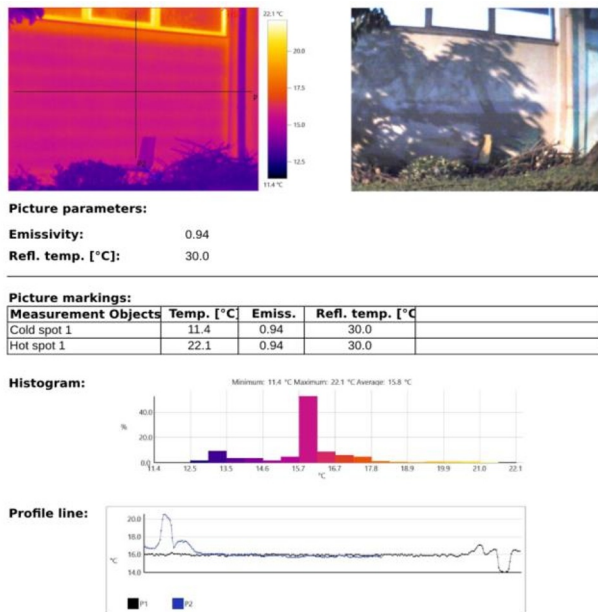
Thermal photo of the masonry wall without ventilated facade. (Source: Authors).
